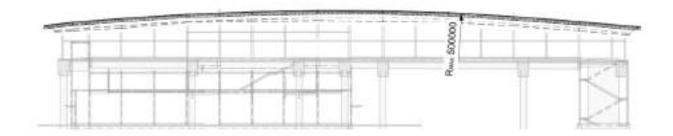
D: WEM Station Canopy: Longitudinal Section
